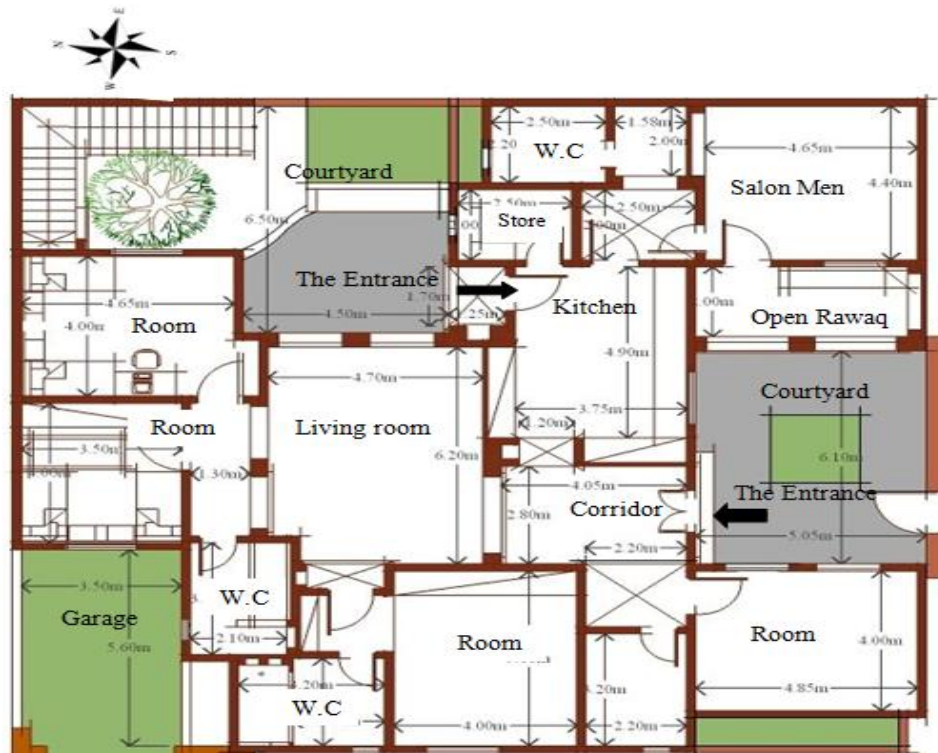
The plan of Mohamed Zatar house in Tripoli.
